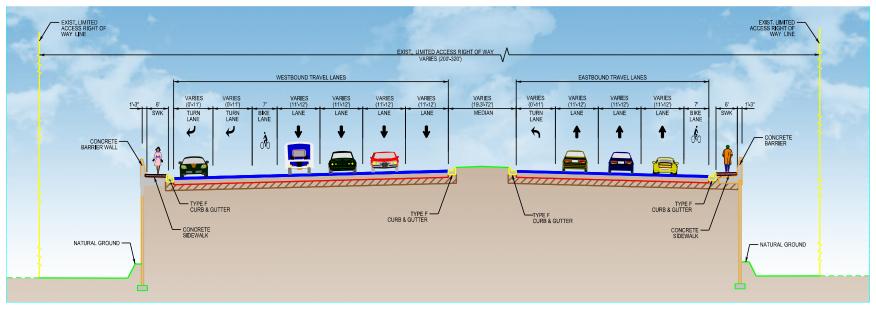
Typical Section - Lantana Road from SR 9/I-95 to Shopping Center Drive
